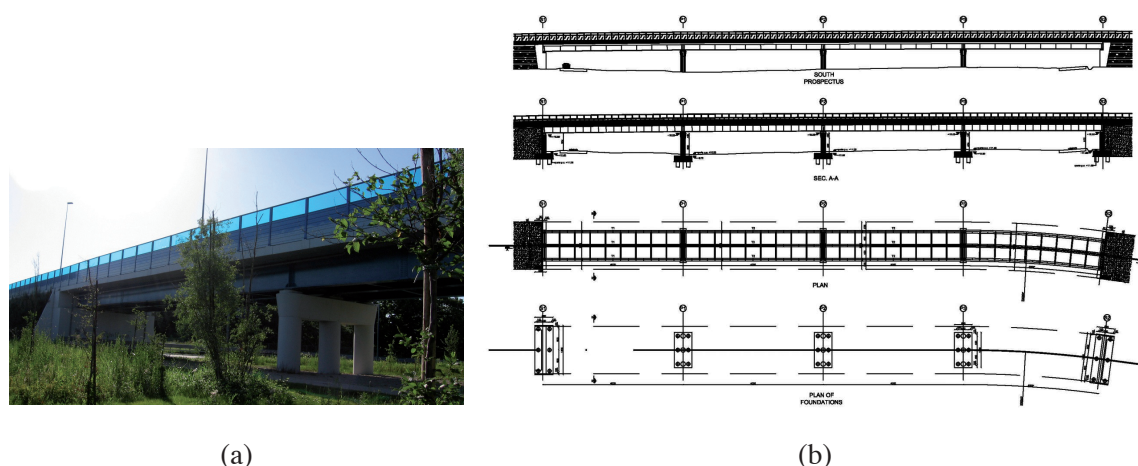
Silea bridge: a) photo of the bridge; b) sketch of the bridge.
